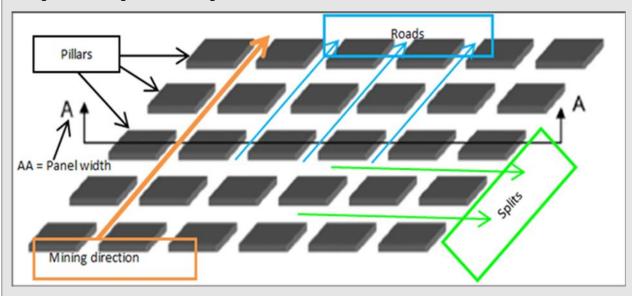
Typical board and pillar mining panel layout for underground extraction.
